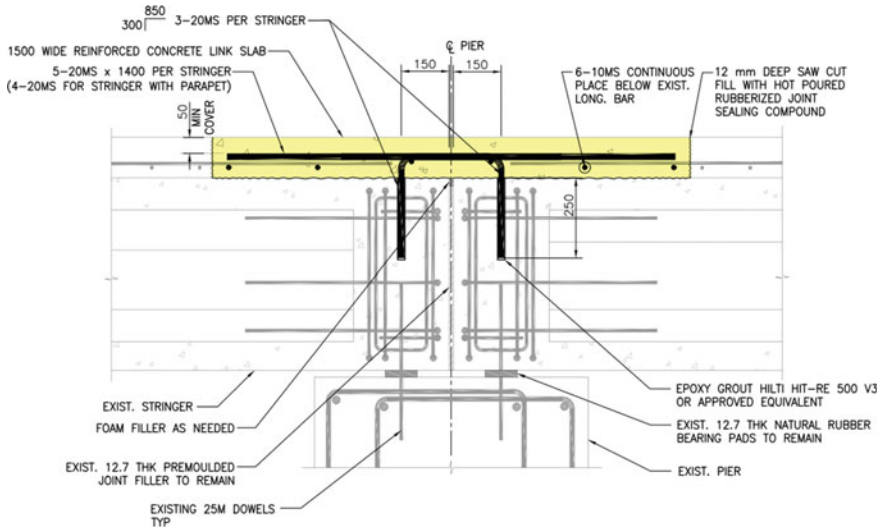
Proposed link slab with L-shape rebar embedded in the box stringer
